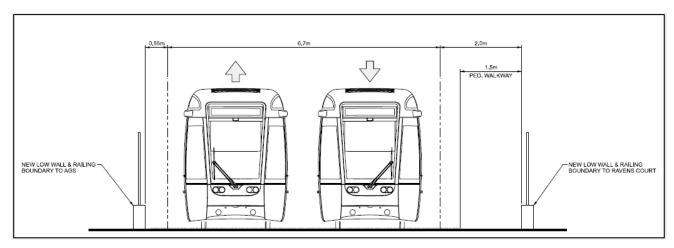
Cross section in front of Raven's Court and through the Garda Station
